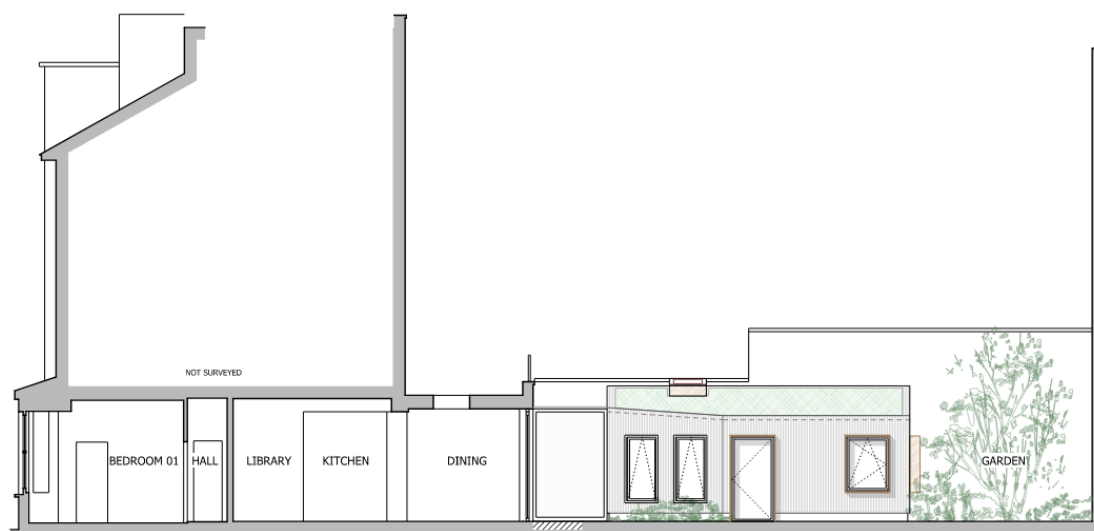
Section showing rear extension against garage building beyond (source: Application documents)
